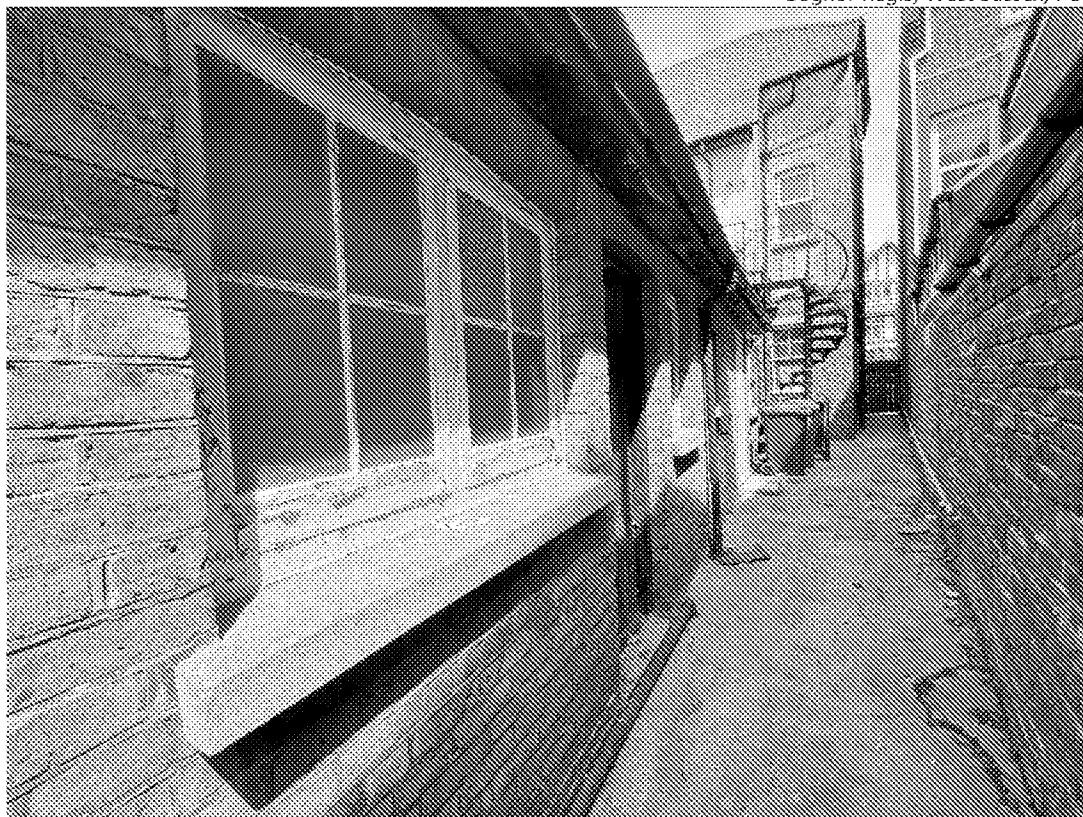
View North Up Passageway Running Alongside Buildings East Elevation to Aldwick Road
